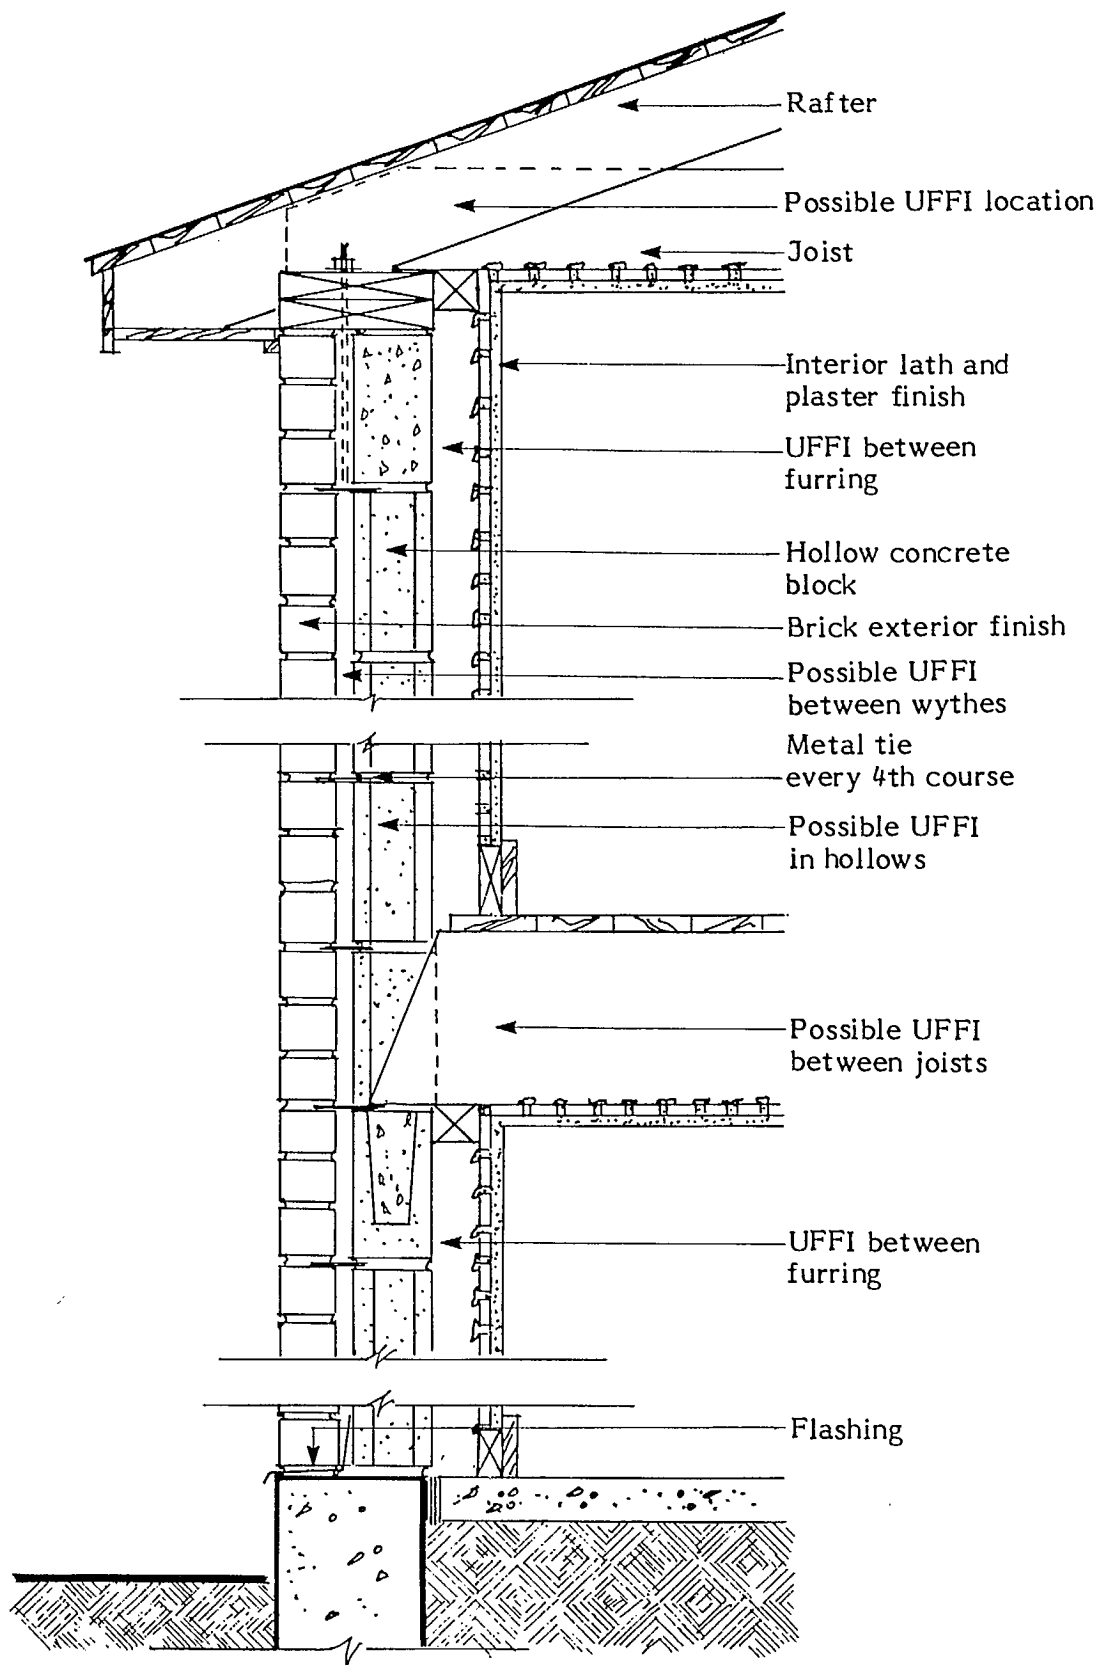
BRICK CAVITY WALL CONSTRUCTION
